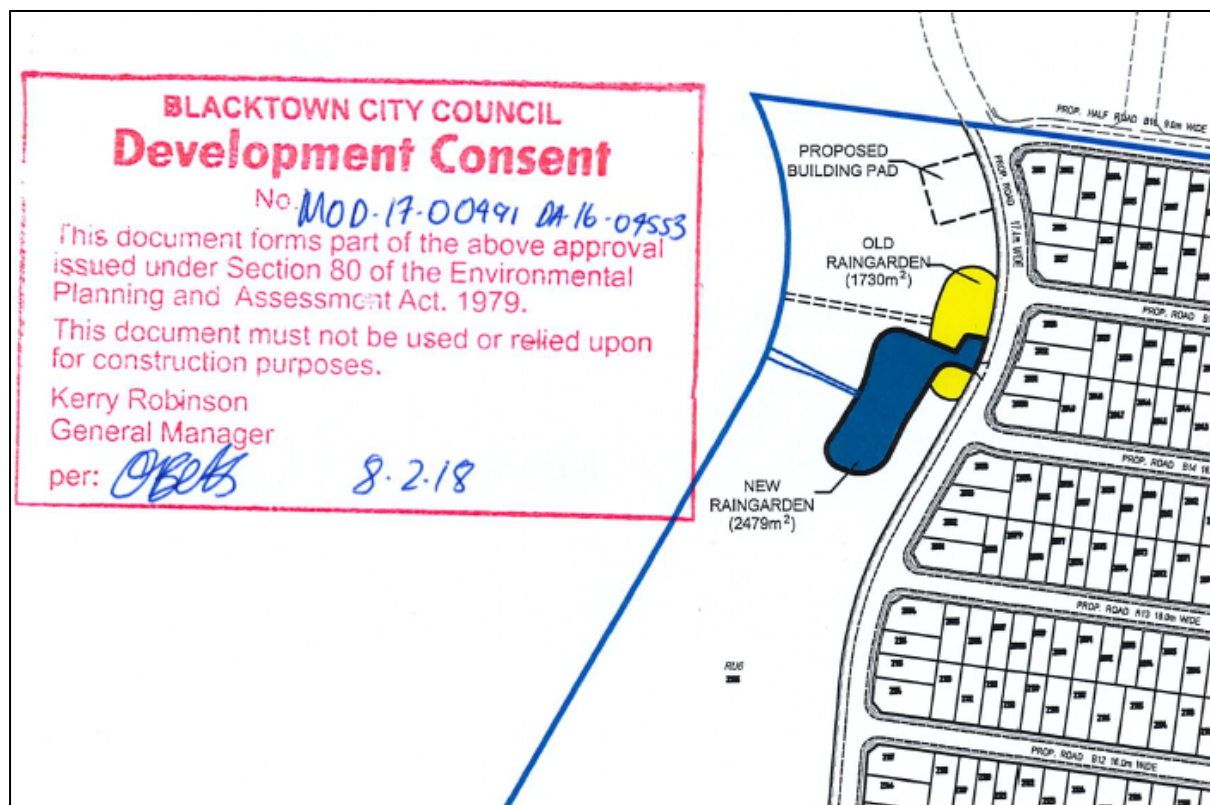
Approved DA site plan for the relocated raingarden (source: Blacktown City Council)
